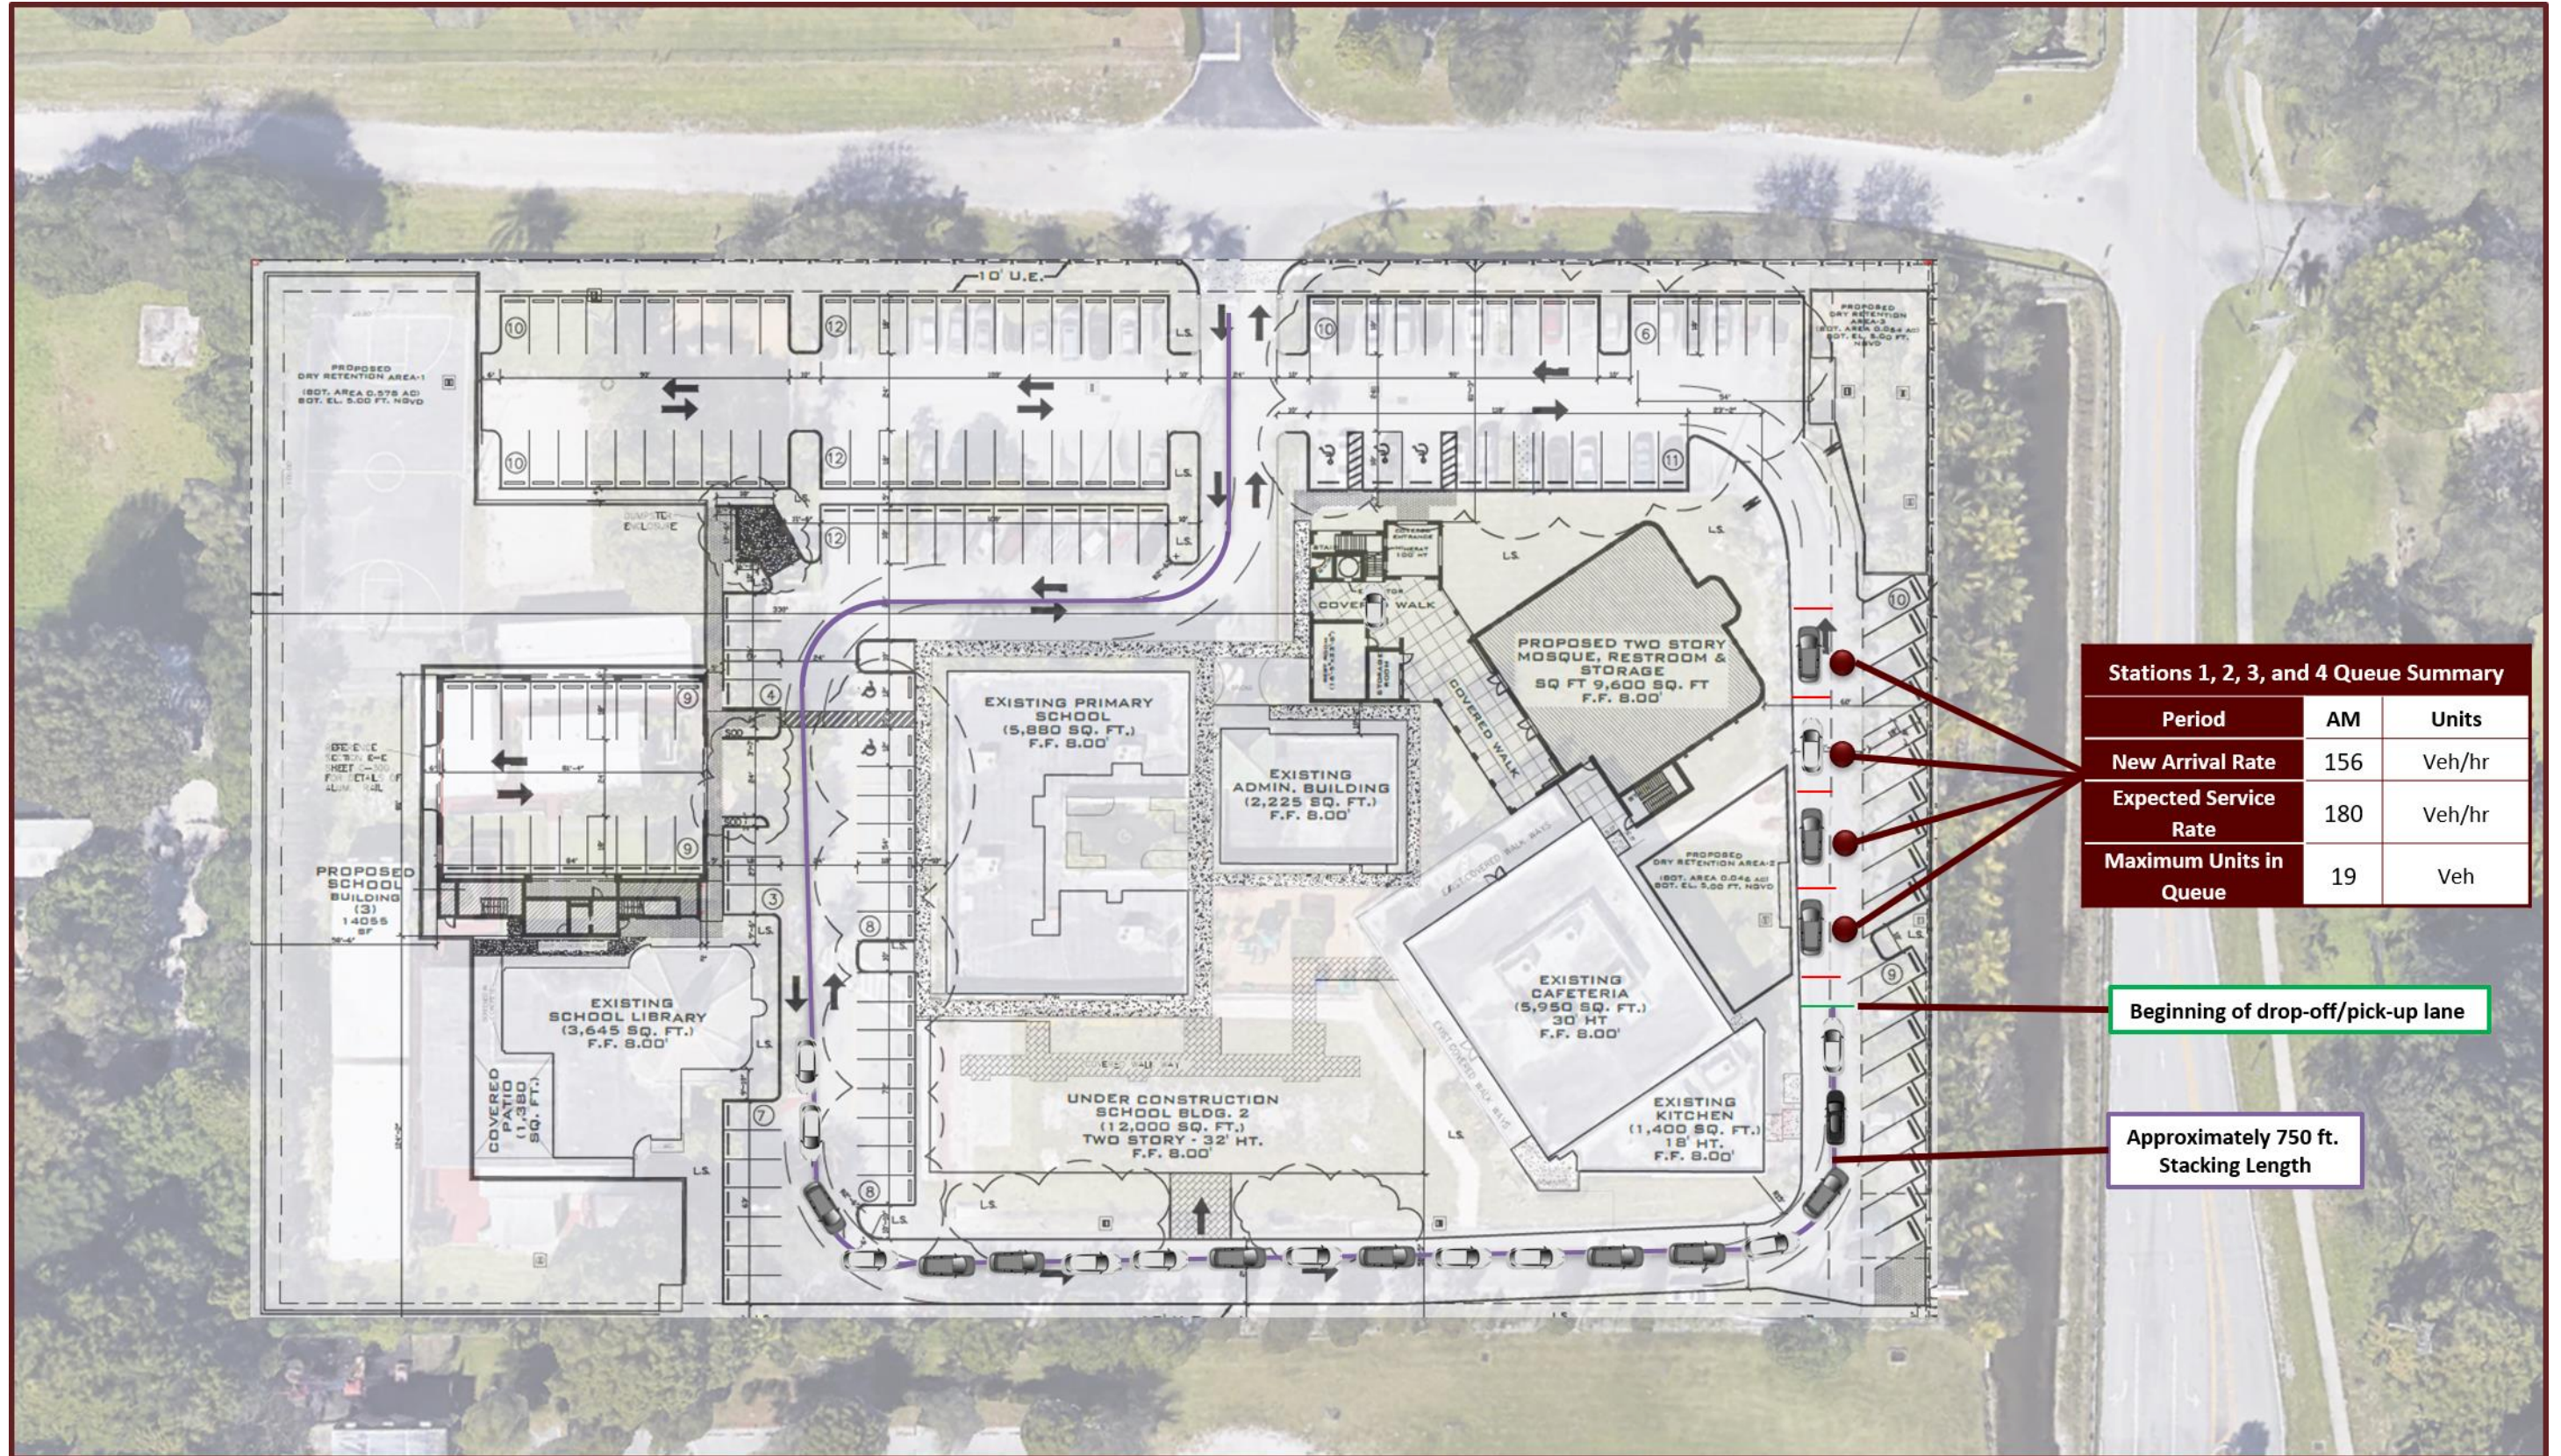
School Drop-off/Pick-up Stations and On-Site Stacking Area
